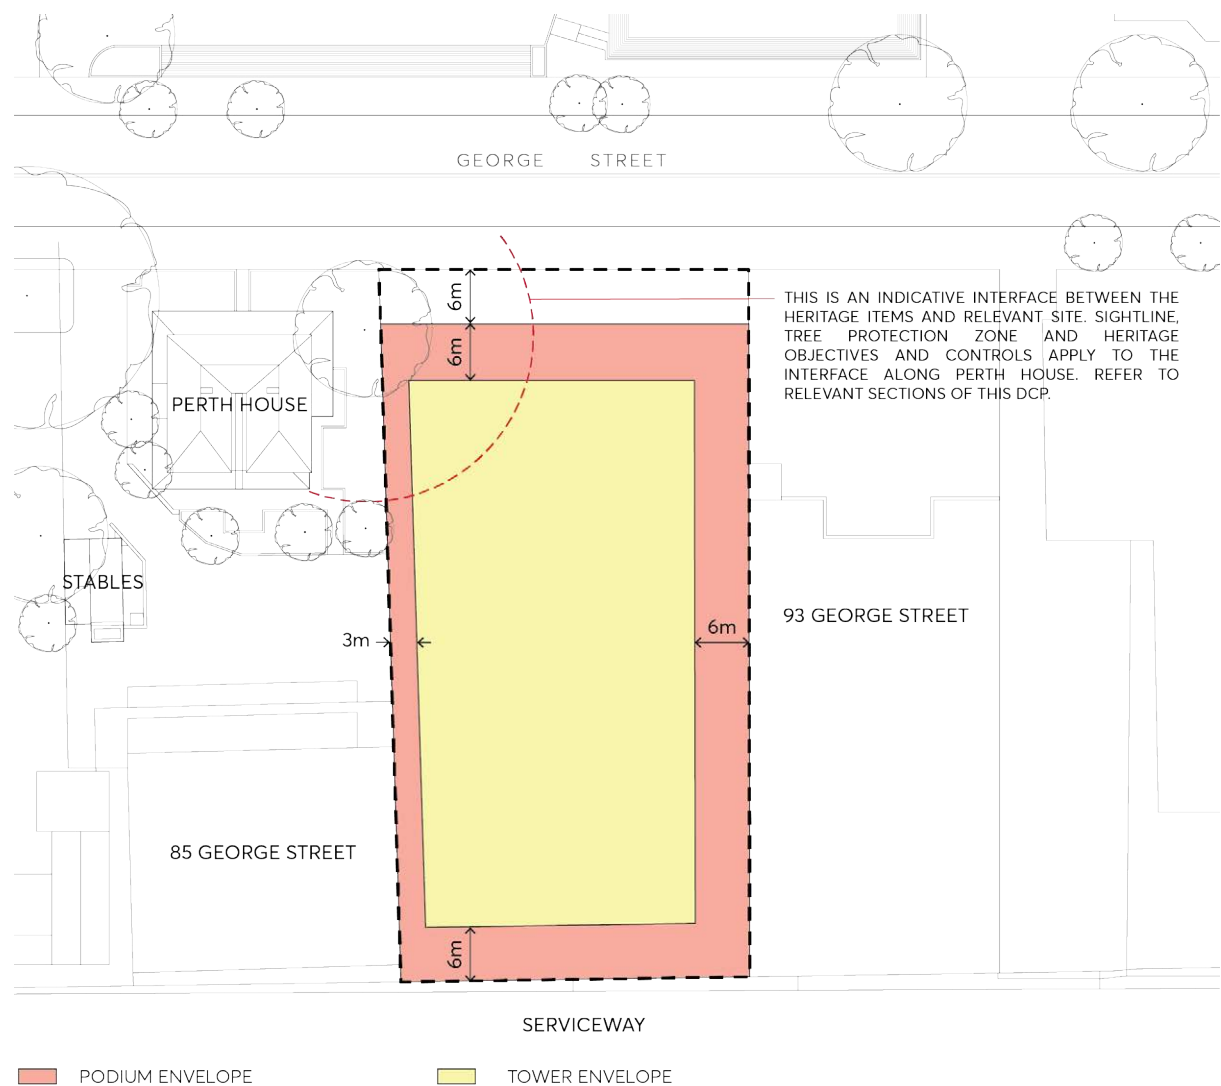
Building Setback Control Diagram (Source: Fender Katsalidis Architects)
